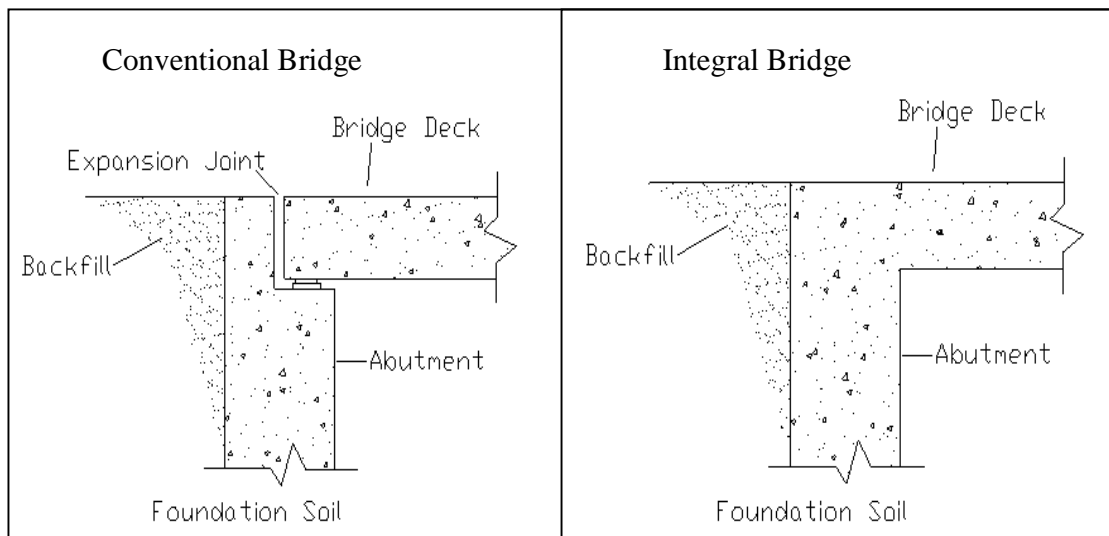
Bridge abutment and deck section showing expansion joint construction in conventional bridges and the jointless construction in integral bridges.
